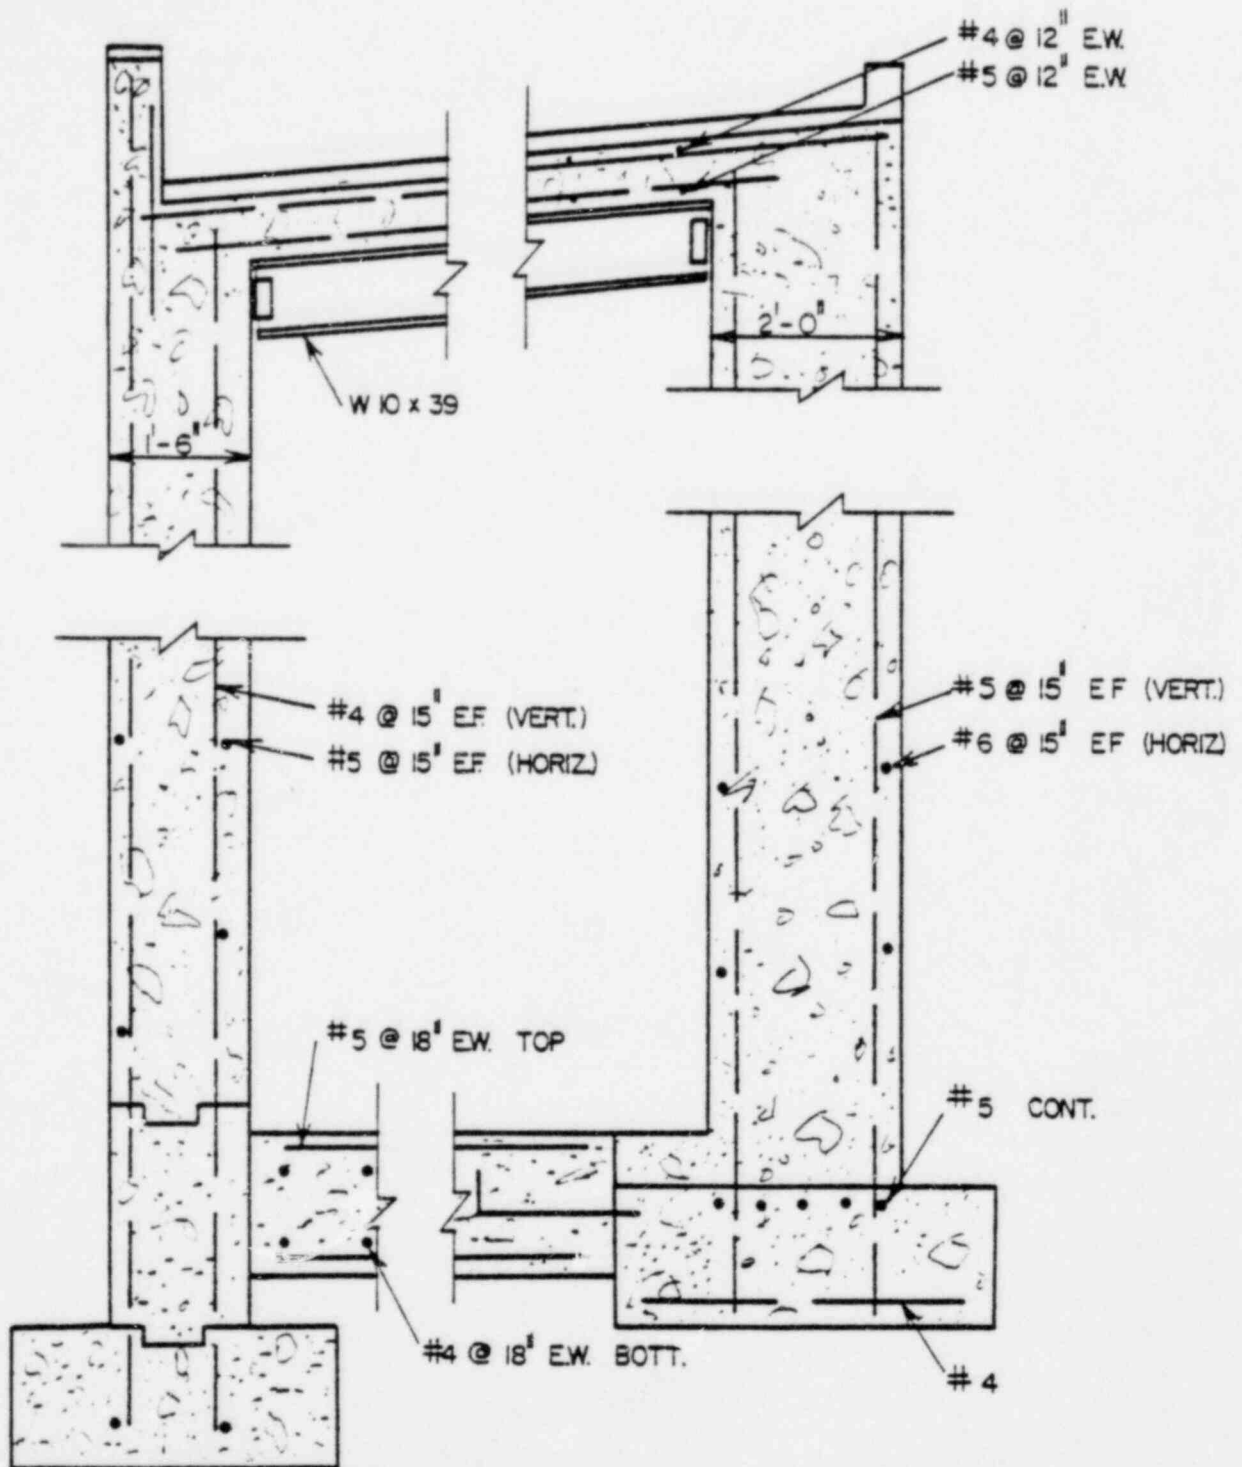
TYPICAL SECTION THROUGH VAULT
